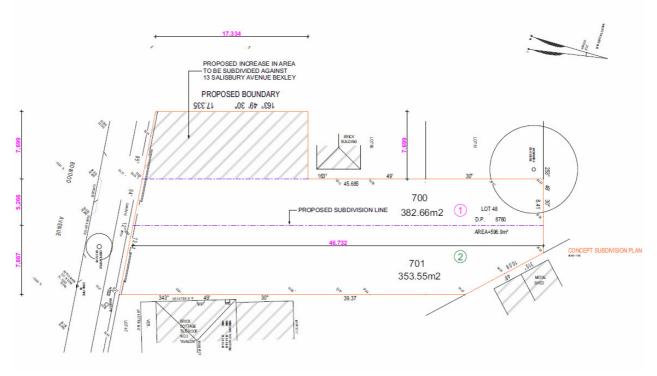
Extract of the concept subdivision plan, prepared by MCAD Design. Source: Concept Subdivision Plan submitted with DA-2016/310
